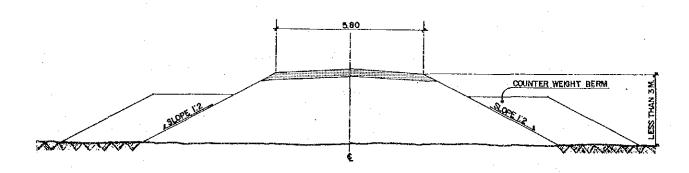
TYPICAL CROSS SECTION ON SOFT GROUND (RAIL LINK)
